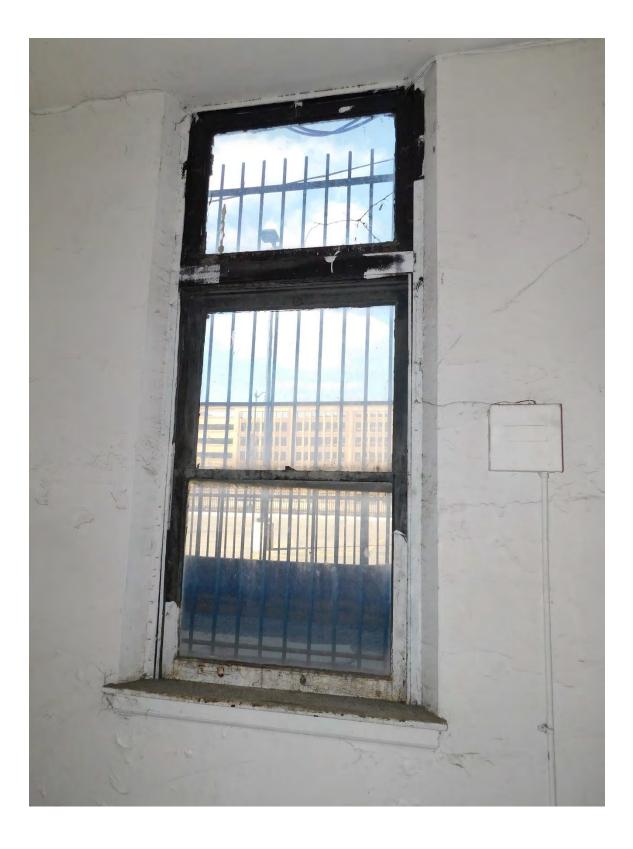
Interior, 1<sup>st</sup> Floor, Window, Looking North. 12/6/19
